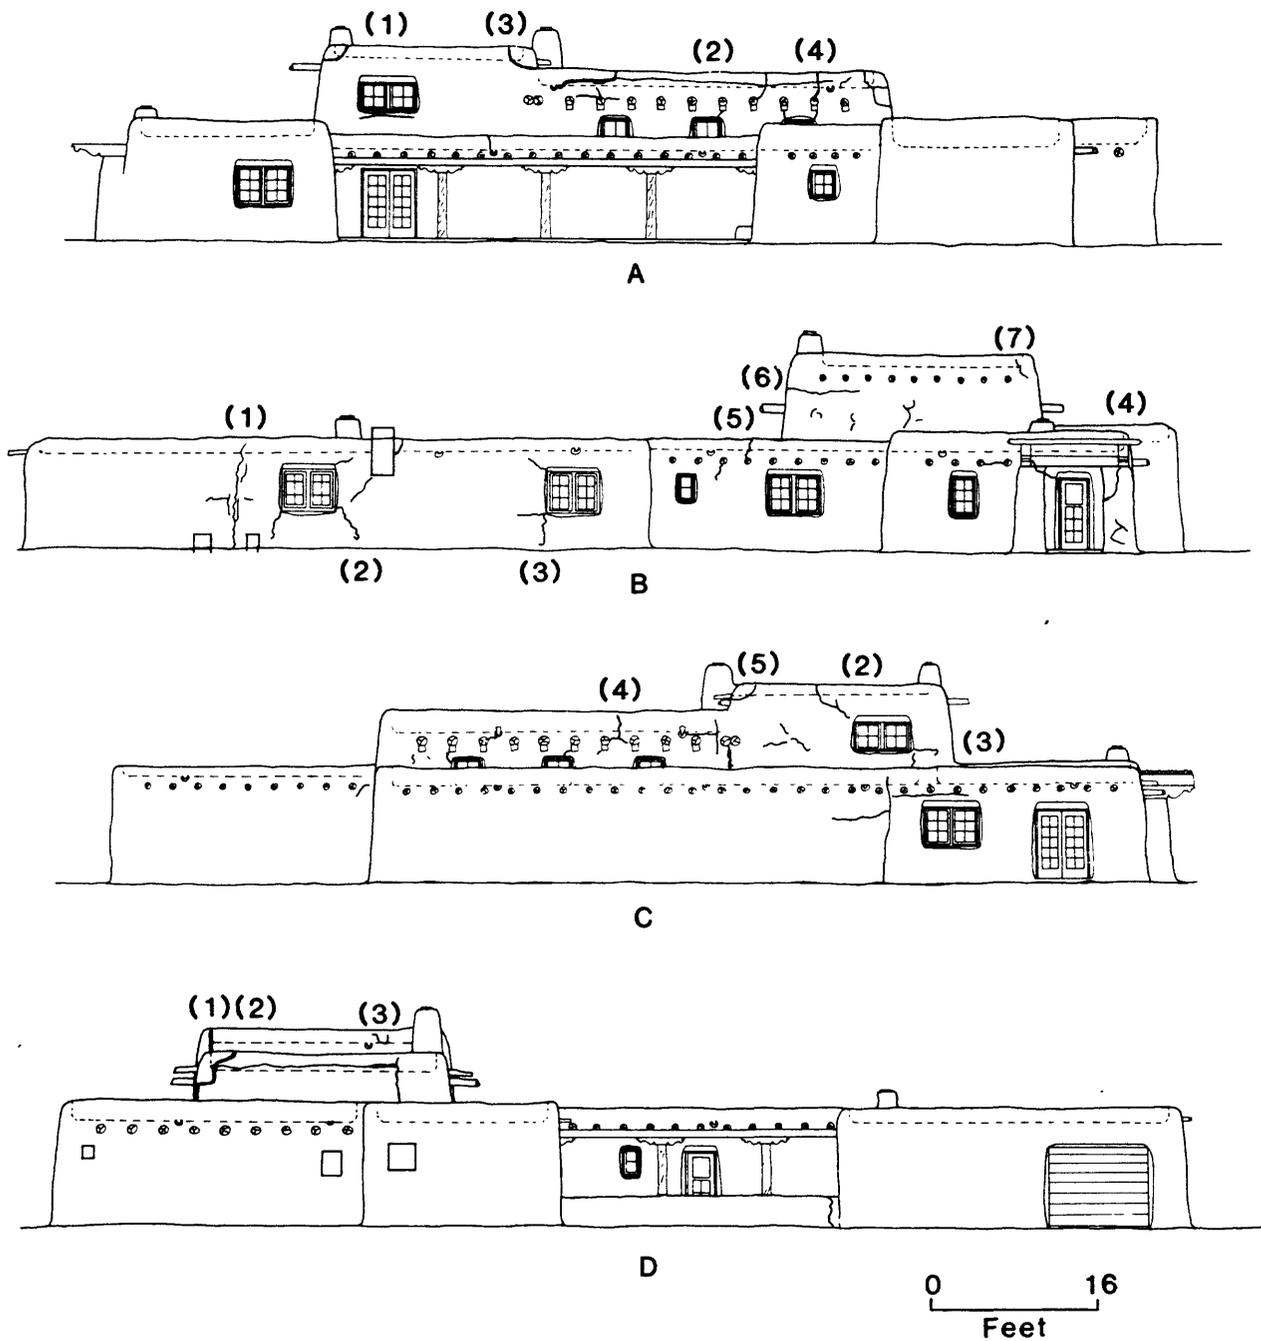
Elevation views of the Museum and Administration building showing the prominent visible wall cracks. Small numbers identify cracks discussed in text. (A) Southeast elevation, front, (B) Southwest elevation, back, (C) Northwest elevation, back, (D) Northeast elevation.
